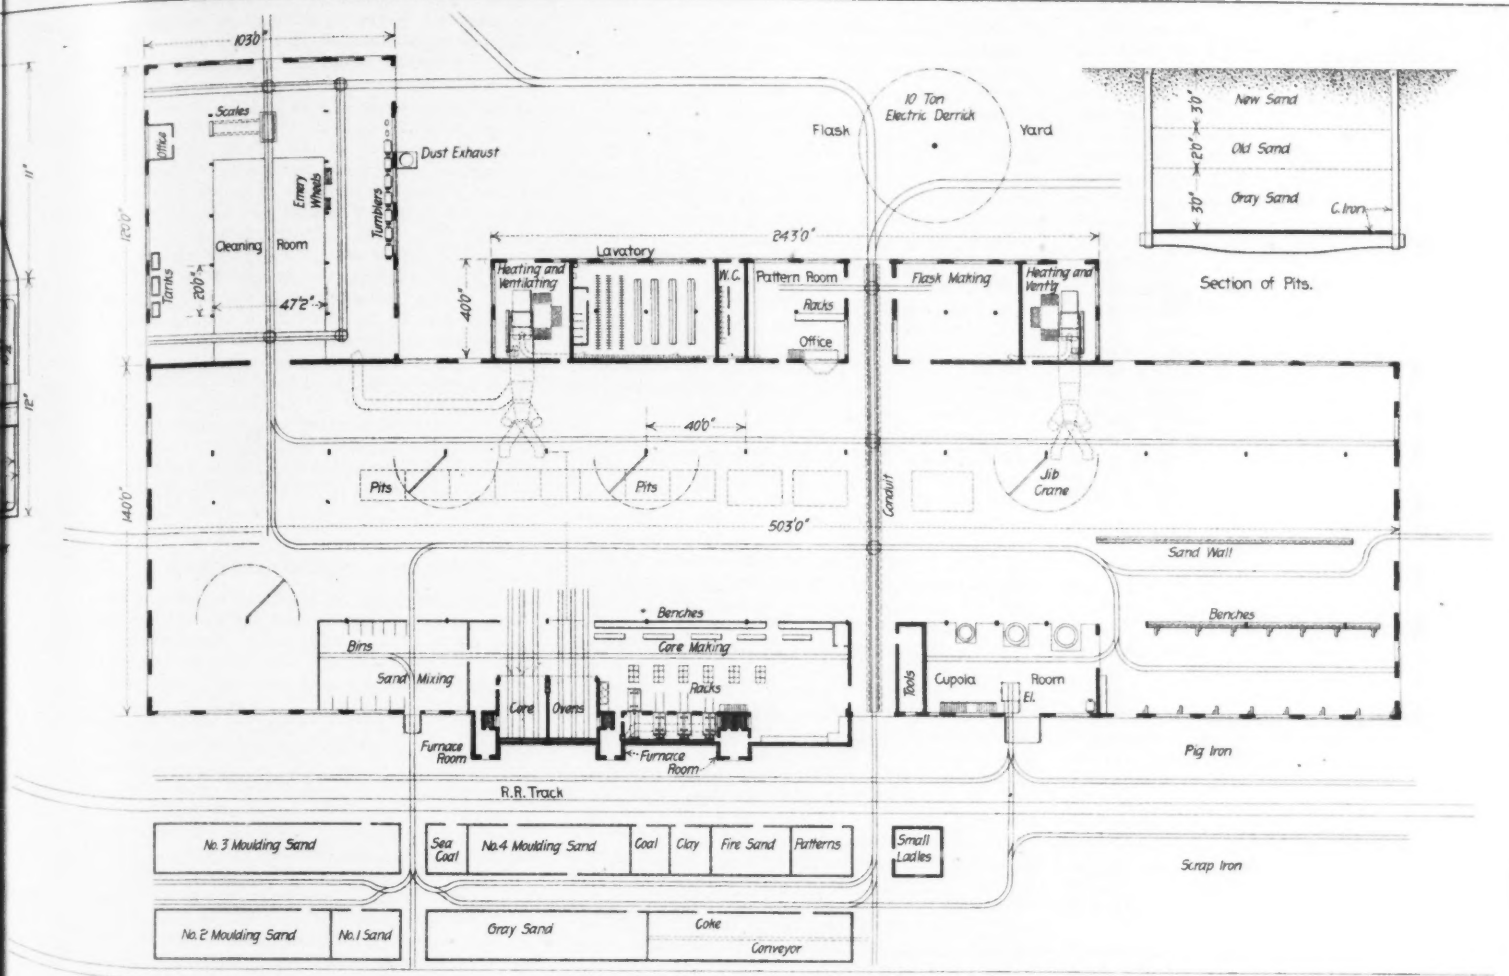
FLOOR PLAN, SHOWING GENERAL ARRANGEMENT.
